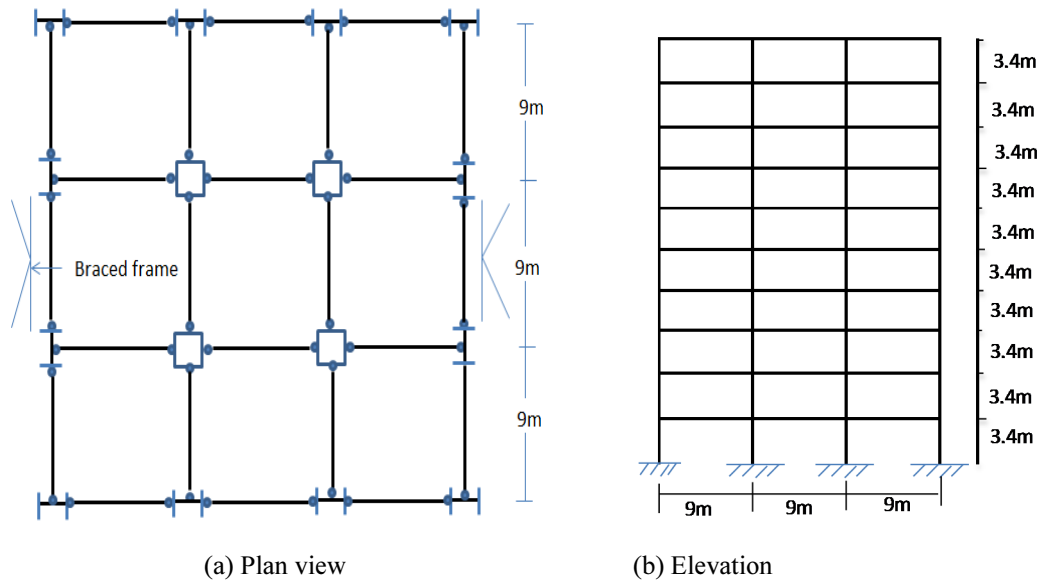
Plan view and elevation of 10- storey moment frame [11]
